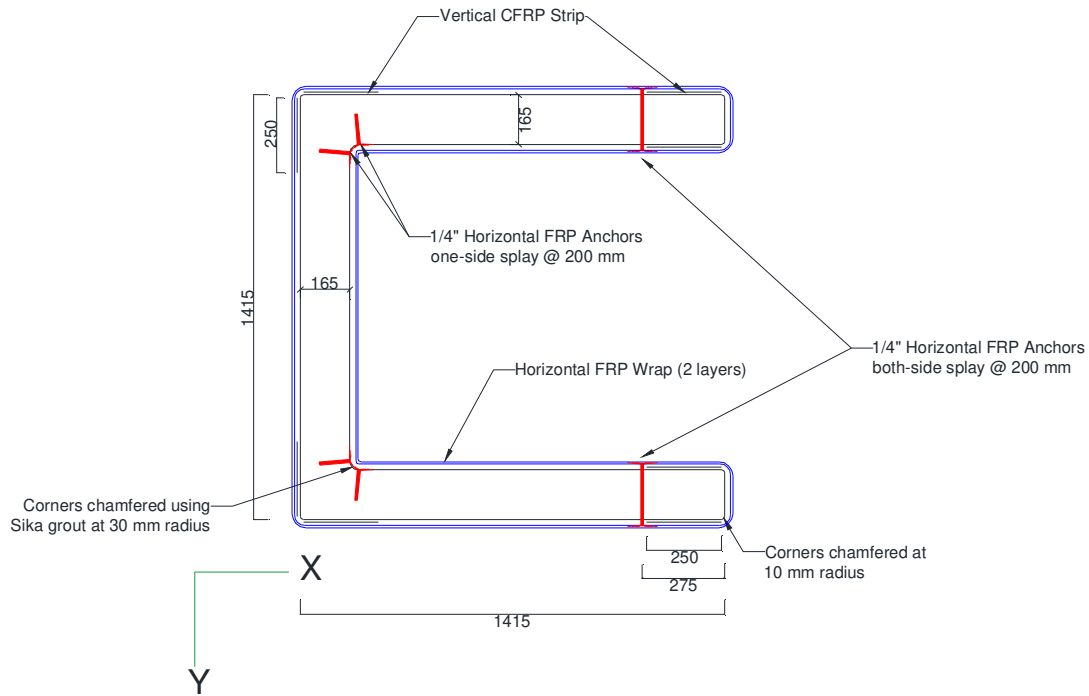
Plan view of the retrofitting scheme of C-shaped wall
